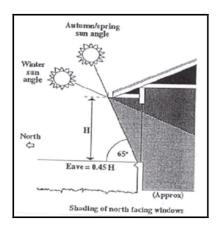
demonstrates the shading of north facing windows in buildings with optimum orientations. Eaves on north facing walls should be designed to completely shade windows in summer but allow the sun to shine through in winter. To calculate the distance the eaves should overhang, from the base of the window on an elevated plan, draw a line at 65°. Methods for shading the glass with be awnings or vegetation should considered.
